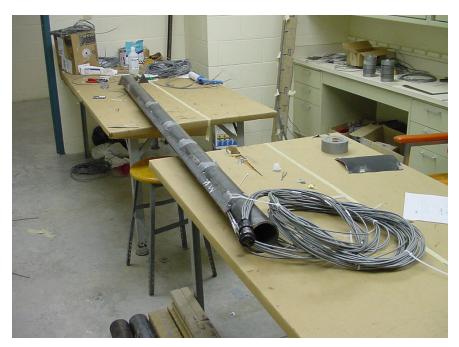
Photograph of instrumented steel pipe member with 0.5-in angle section to protect gages during installation.
